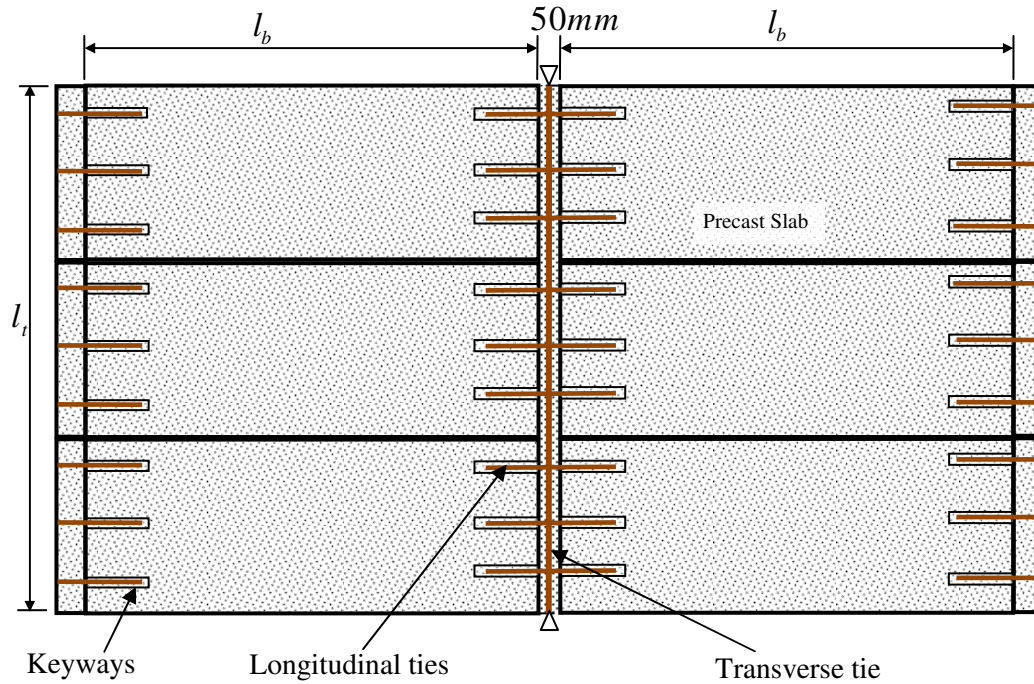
Floor-to-floor system facilitated by longitudinal and transverse ties.
